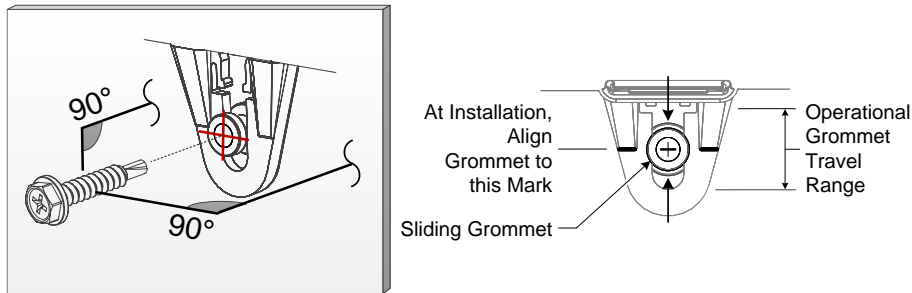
Supplied Mounting Hardware – Drive the screw at a right-angle to the VAV Box
